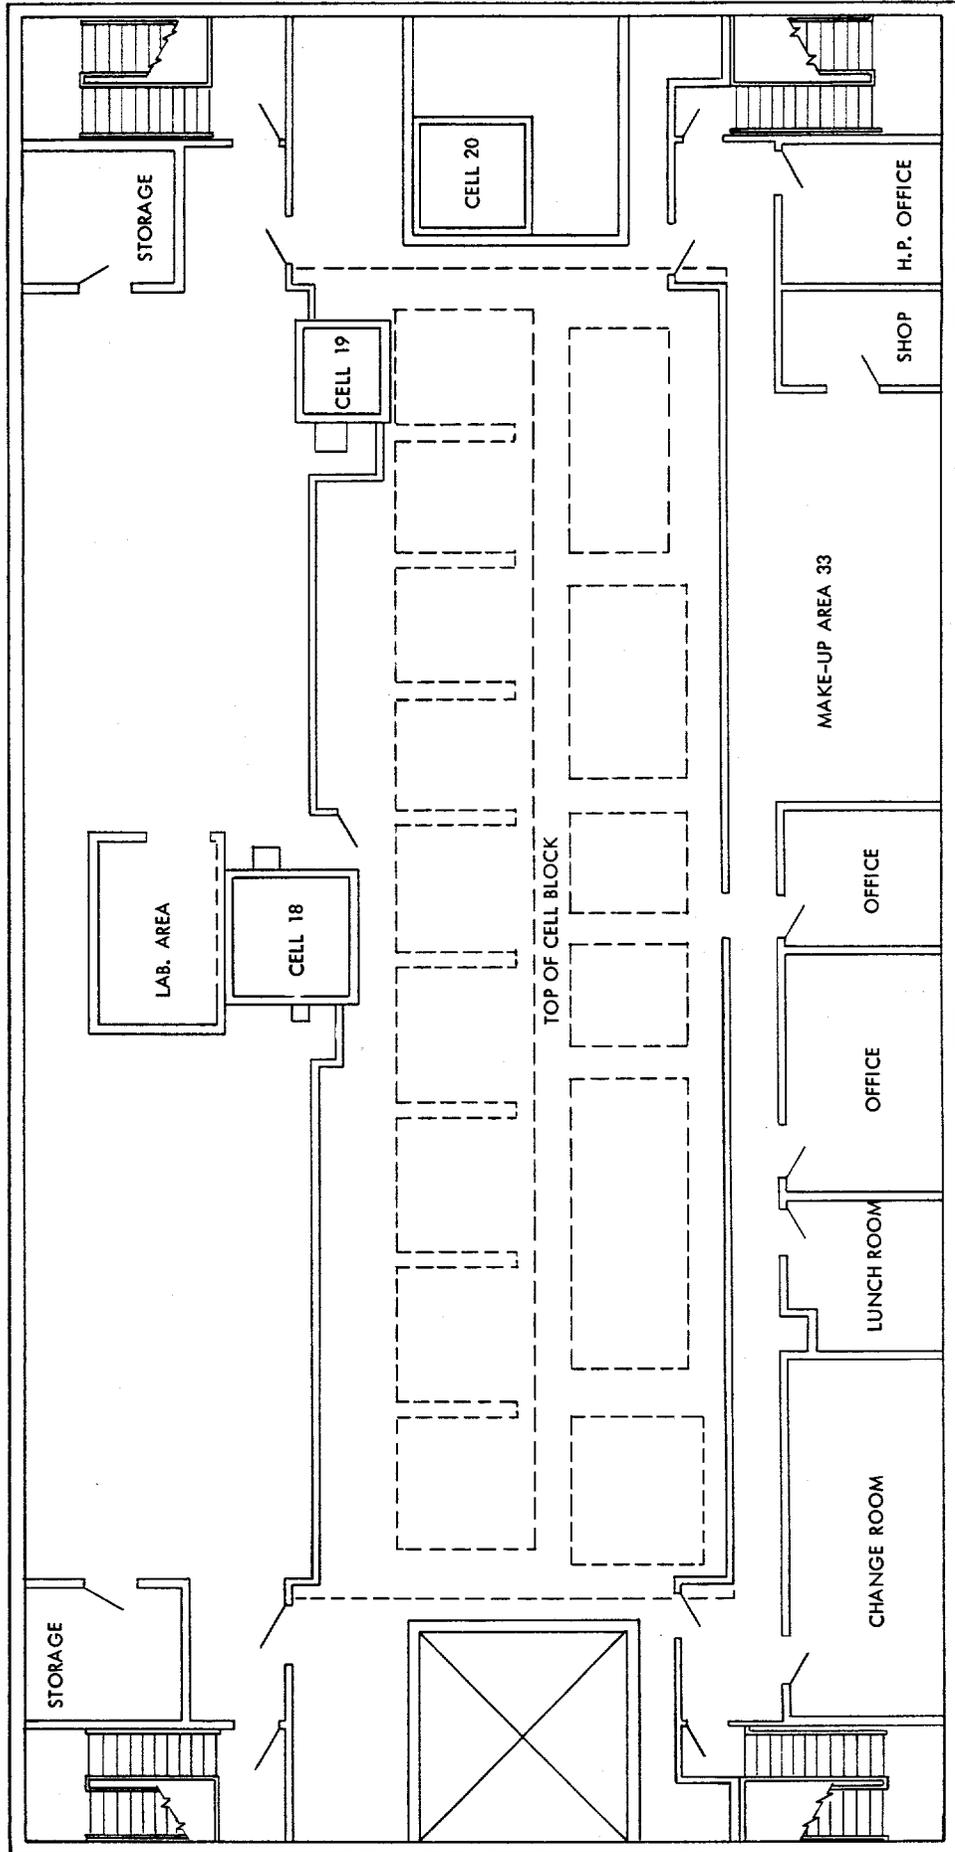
BLDG. 3517 SECOND FLOOR PLAN
